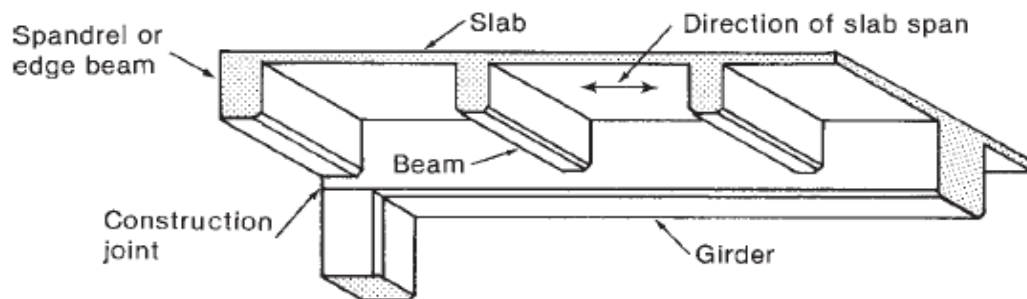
Slab, beam and girder floor system (Macgregor & Wight, 2012)
